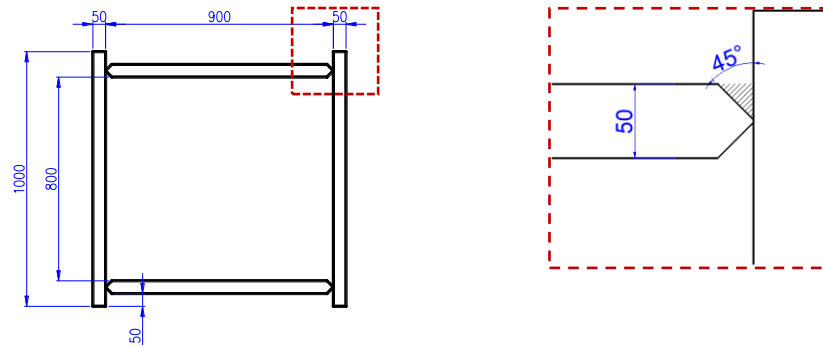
shows S690 50 mm thick welded box section examined by the author in a construction site. This box section is 2.5 m in length, and an experienced welder spent 5.5 hours to perform welding of one single groove with submerged arc welding. If Grade S460 steel is used instead, the plate thickness of S460 steel should be 75mm in order to achieve the same cross-sectional resistance as follow:
